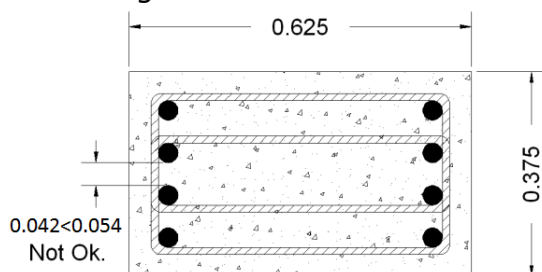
Final design section for the column of Example 9.6-2.
